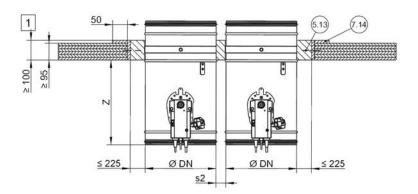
Mortar-based installation into a solid wood wall or CLT wall
